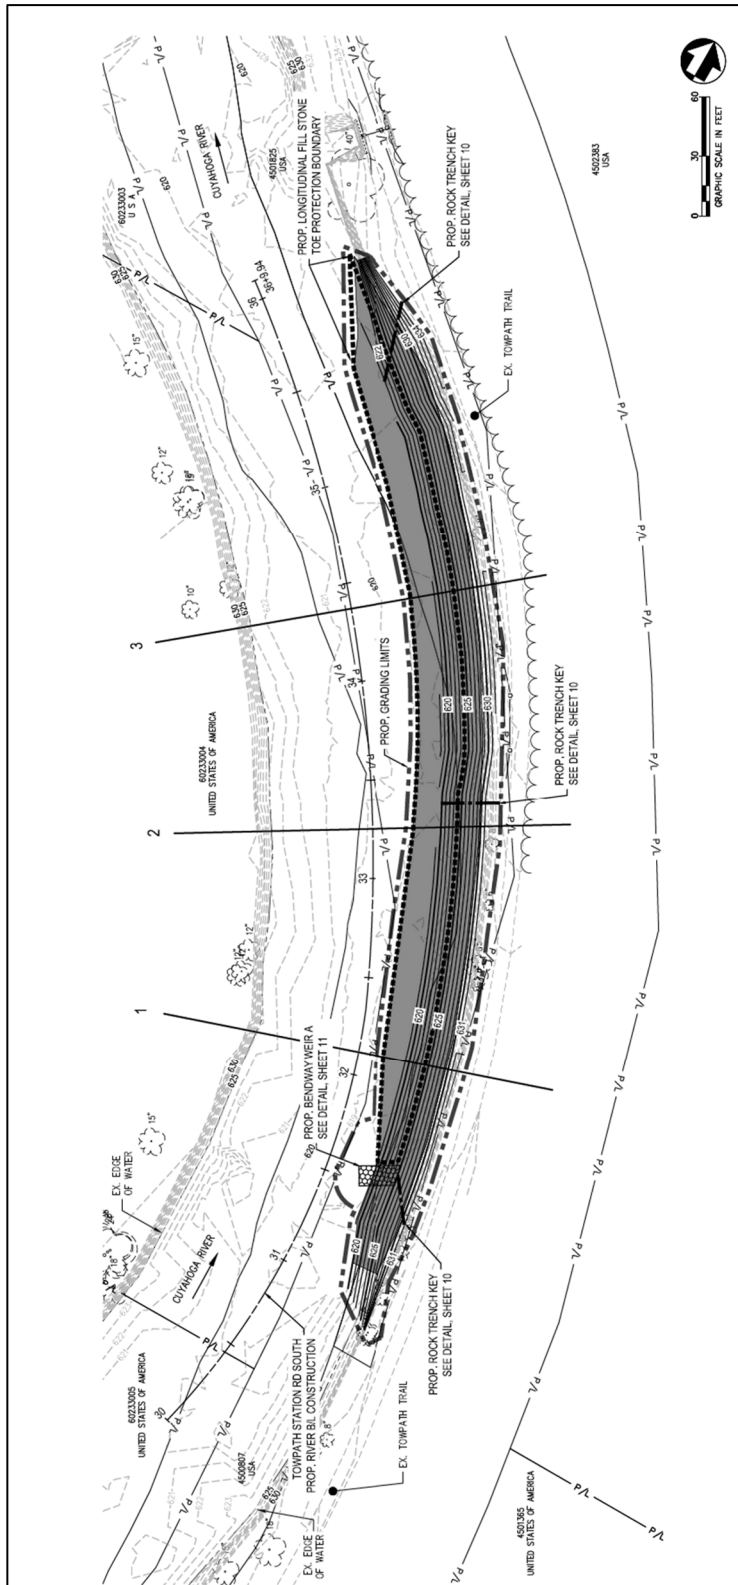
Towpath Trail: Station Road South: Proposed Grading Plan (from Sheet 14 of the Drawings)
